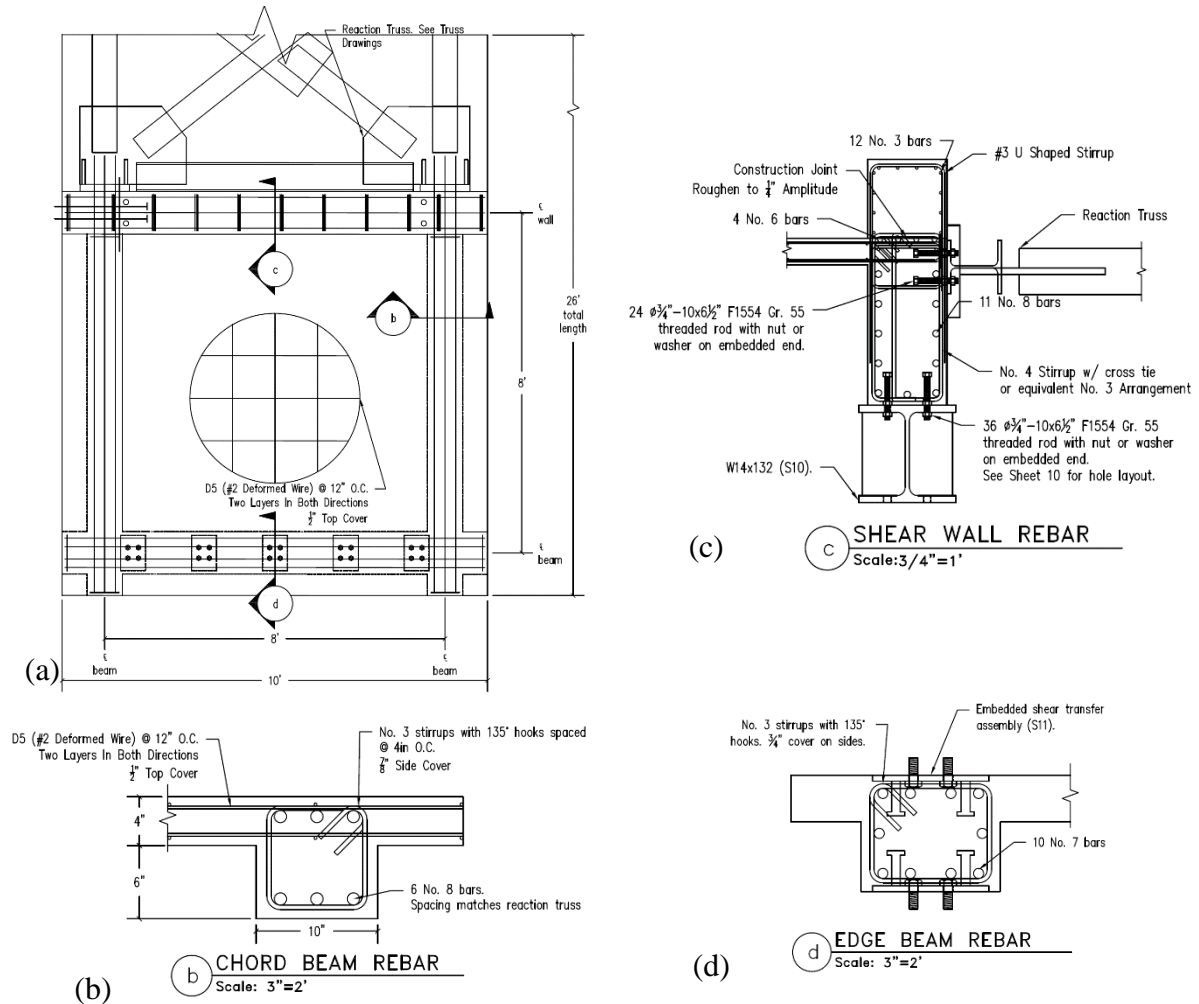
Test Specimen Construction Details: (a) Plan View of the Diaphragm; (b) Chord Beam Reinforcing; (c) Shear Wall Segment Reinforcing; (d) Edge Beam Reinforcing with Embedded Shear Transfer Assemblies.
